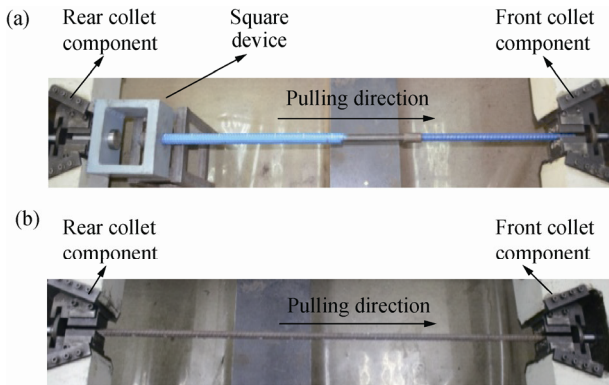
Installation of the bolt during the pull test: (a) CRLD bolt; (2) rebar bolt.
